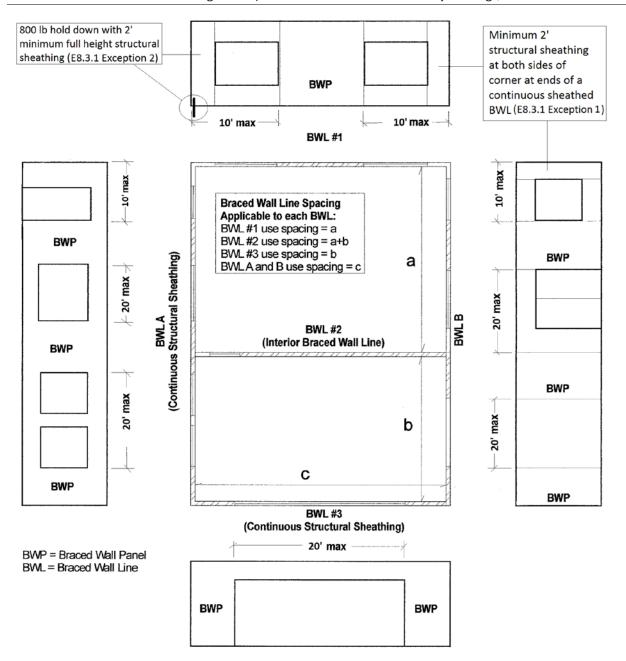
Braced Wall Lines, Braced Wall Panels, and Braced Wall Line Spacing
